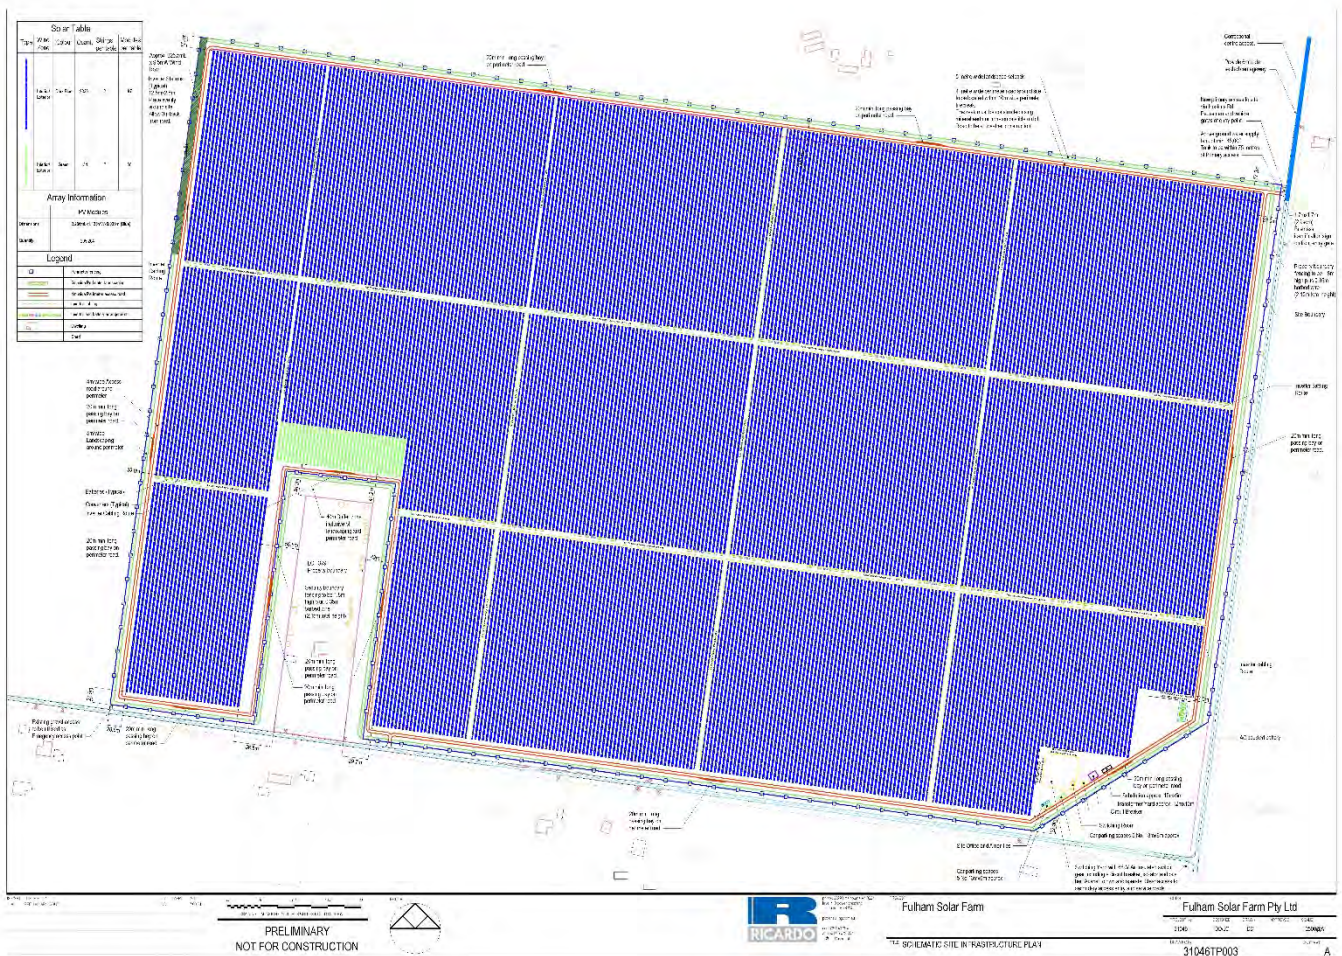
Solar farm layout plan prepared by Ricardo Energy Planning and Environment. Source: Ricardo.
